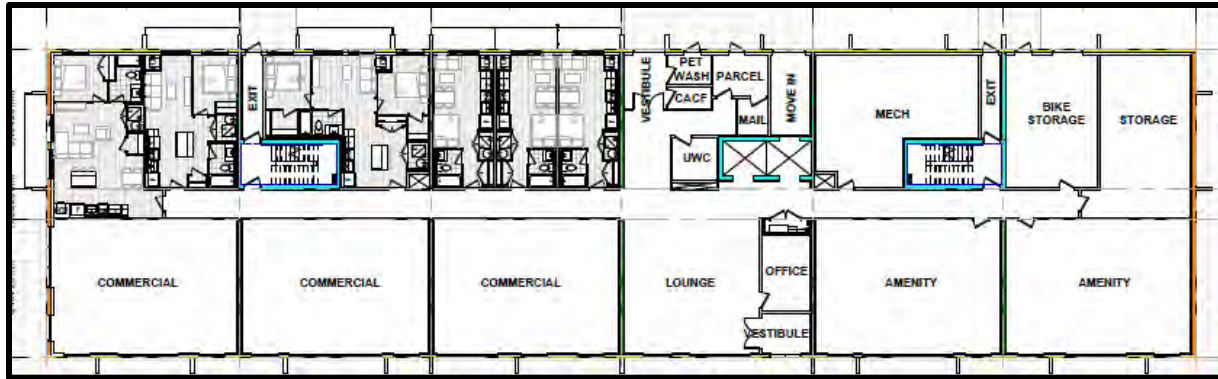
excerpt from Appendix III – Ground Floor Layout
